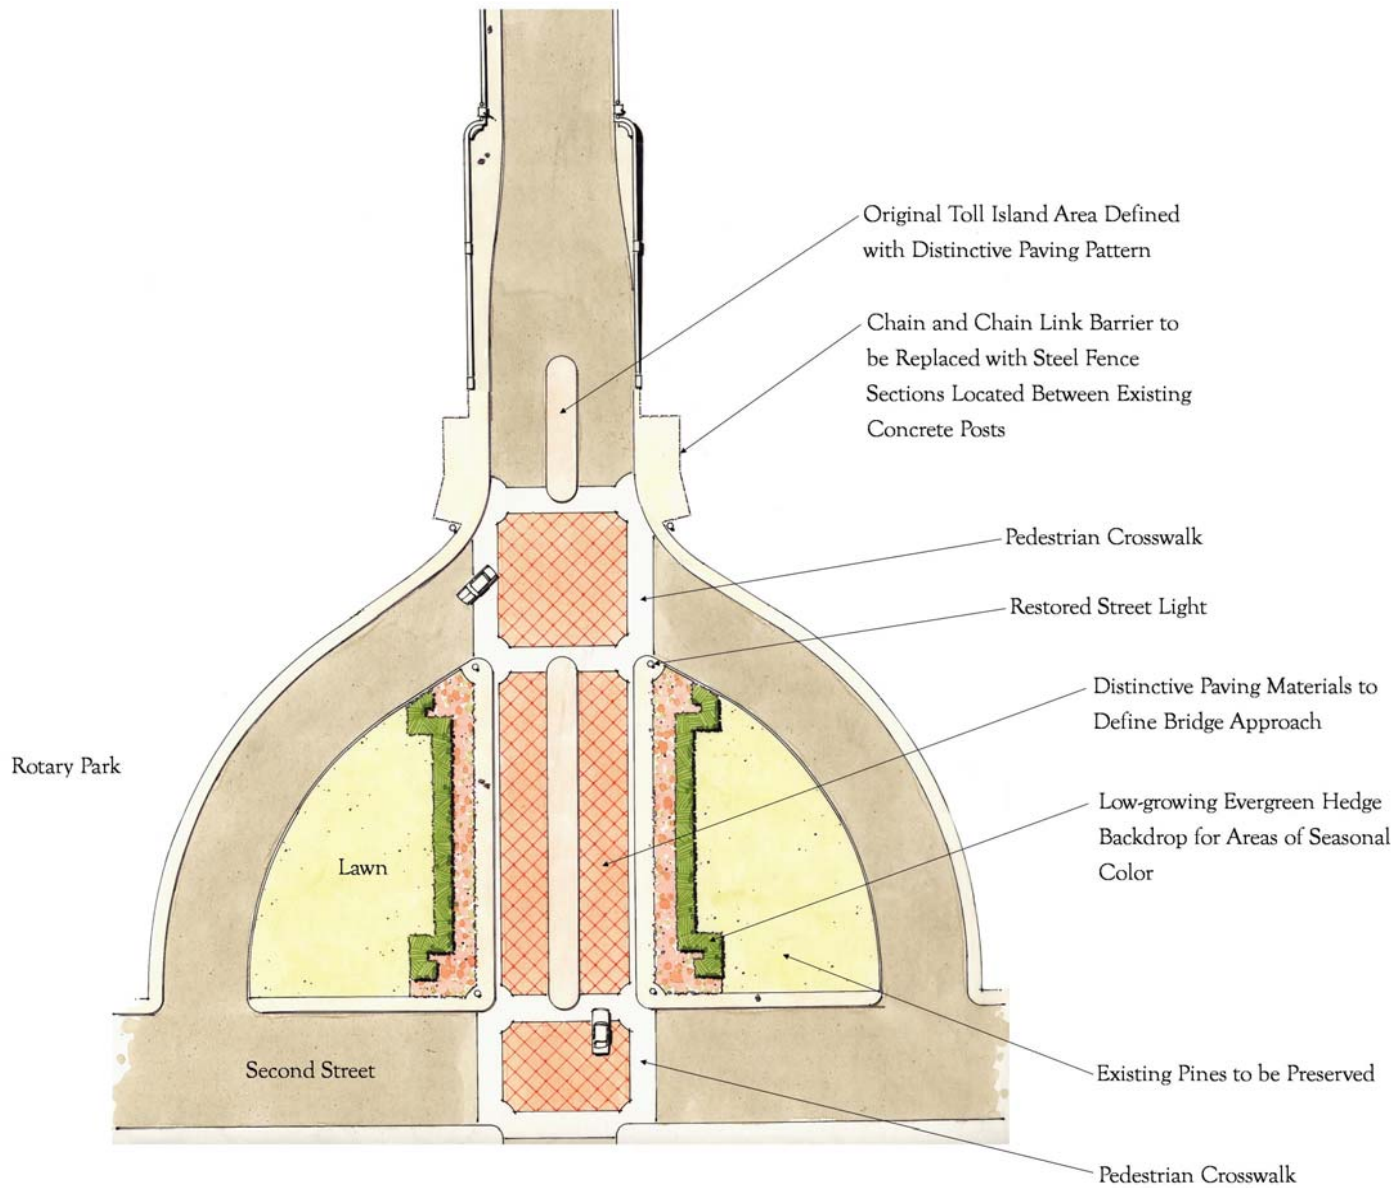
Proposed design for eastern bridge plaza (Columbia)
